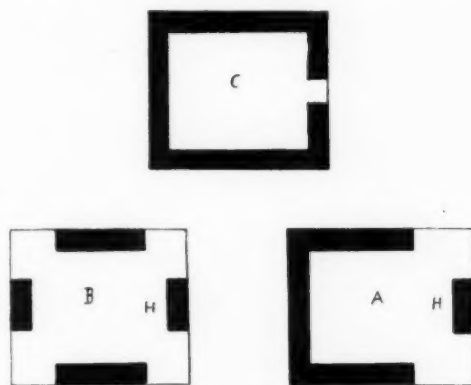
DISPOSITIONS OF FARM BUILDINGS AROUND A FOUR-SIDED SPACE.
